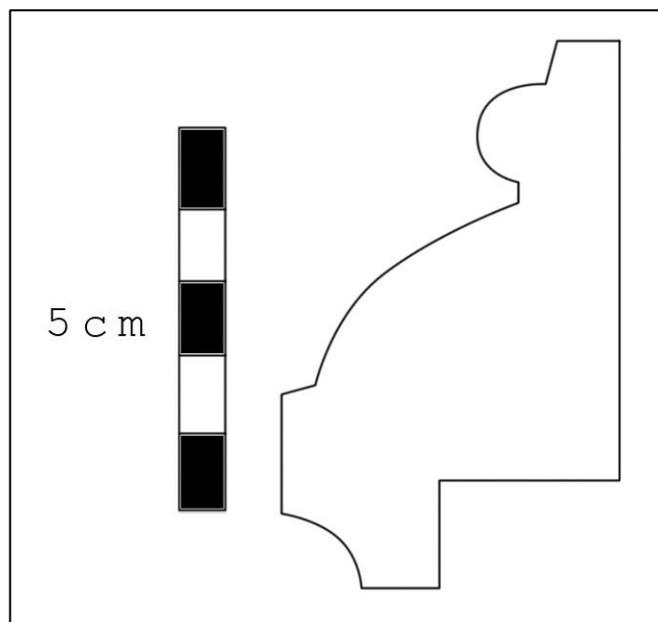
Profile of decorative moulding from Room 4 (Hallway).
